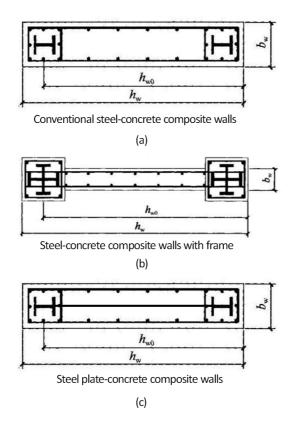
Section configurations of SC composite walls in JGJ 138 (2016)
